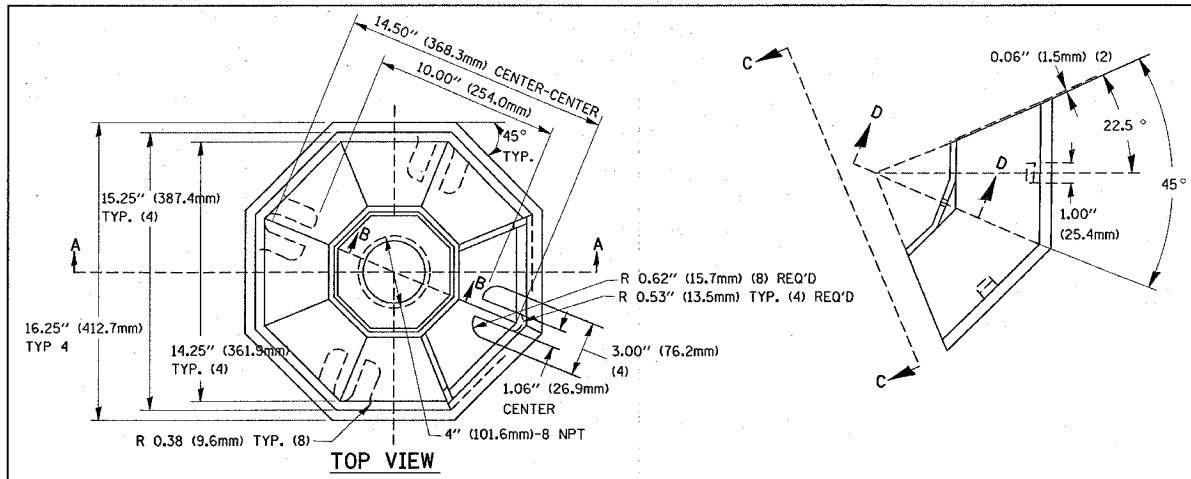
DETAIL HANDHOLE TO INTERCEPT EXISTING CONDUIT N.T.S.
